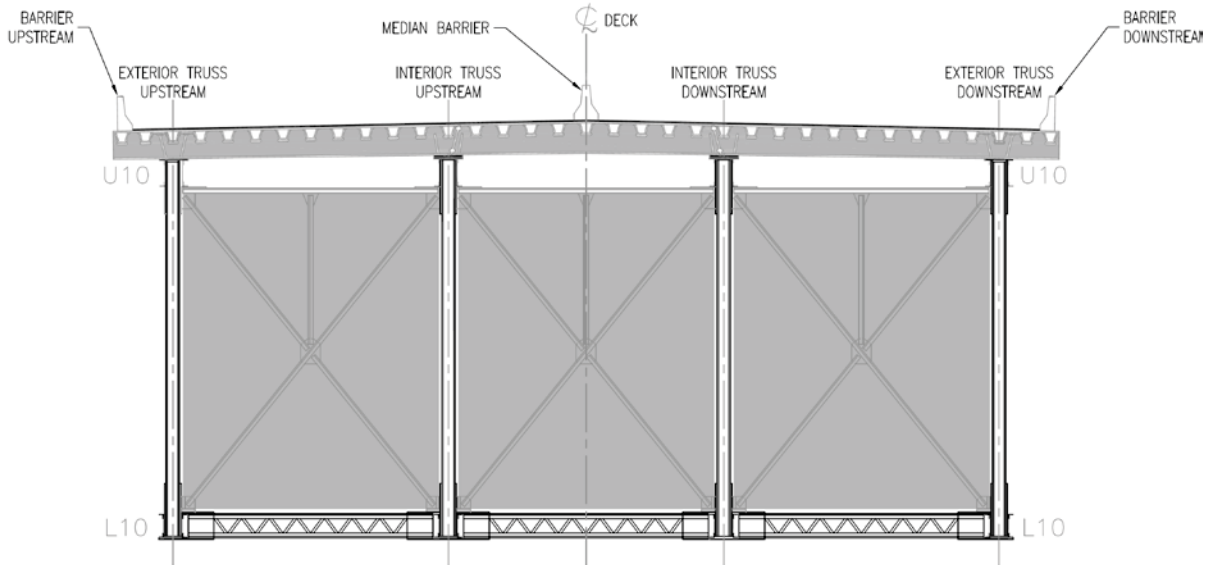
Typical cross-section of spans 4W-2W/2E-4E – Section 6 (Source: JCCBI nomenclature drawings)
